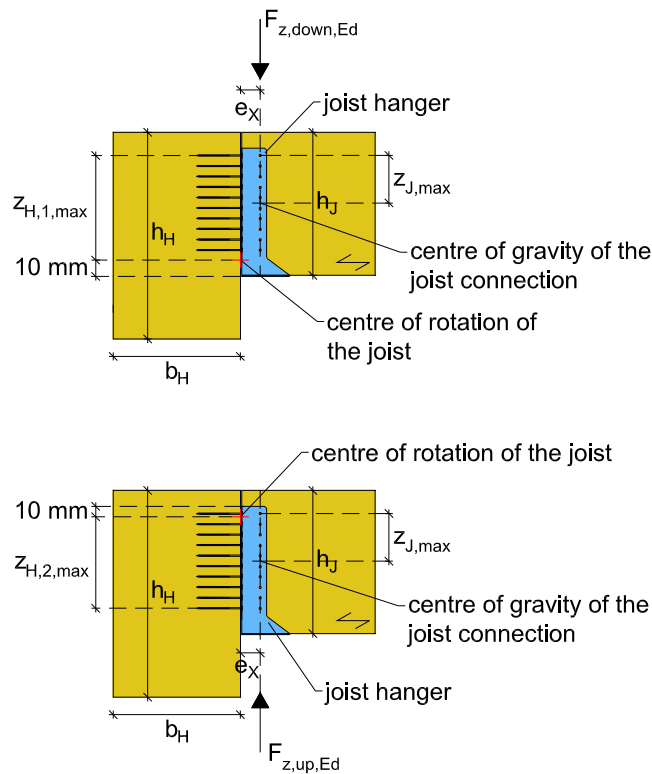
Load direction Z: notation and joist hanger dimensions
